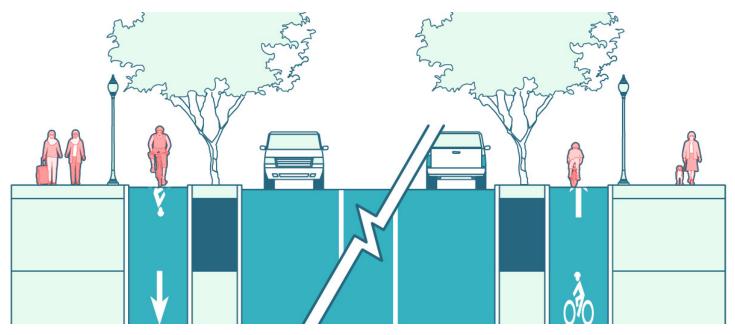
One-way Separated Bike Lane, Tree Separated, Permanent Condition: Downtown Street, Town Center Street, Industrial Street
